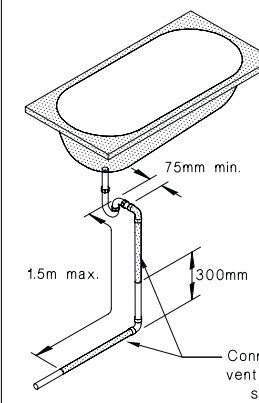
Acceptable location for connection of fixture vent pipes to fixture discharge pipes
